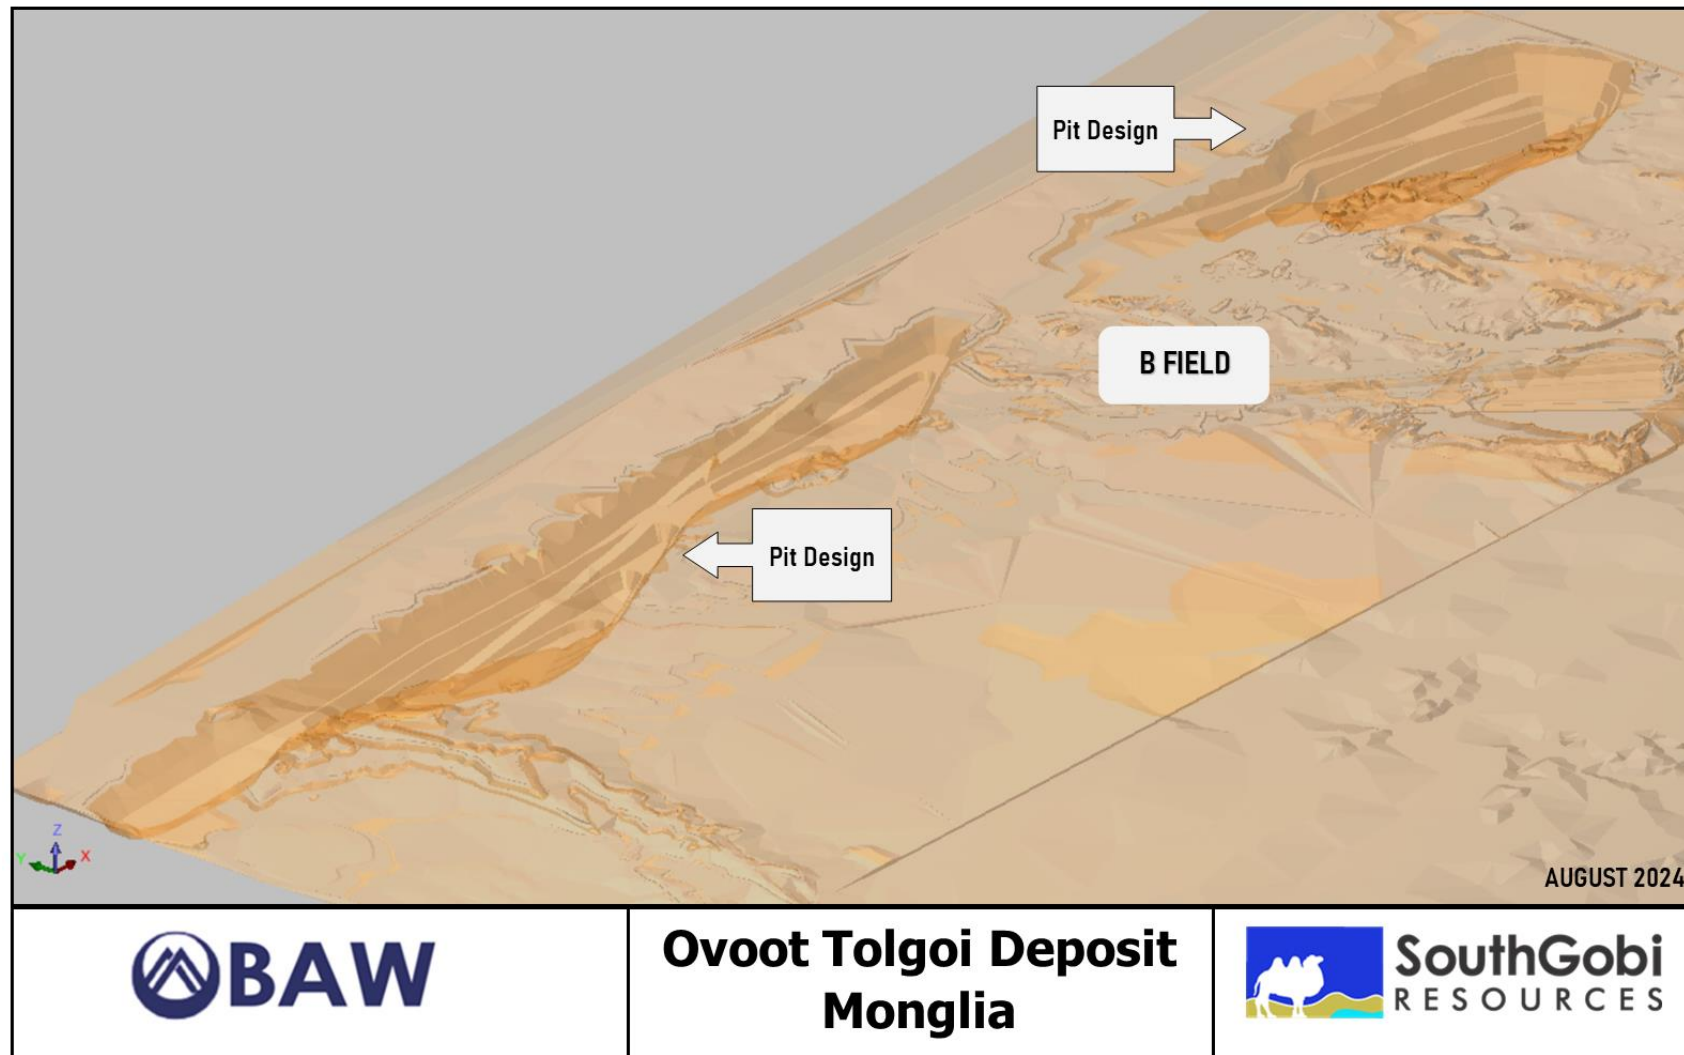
3D view of the B Field Pit Shell 2022 (not to scale)
